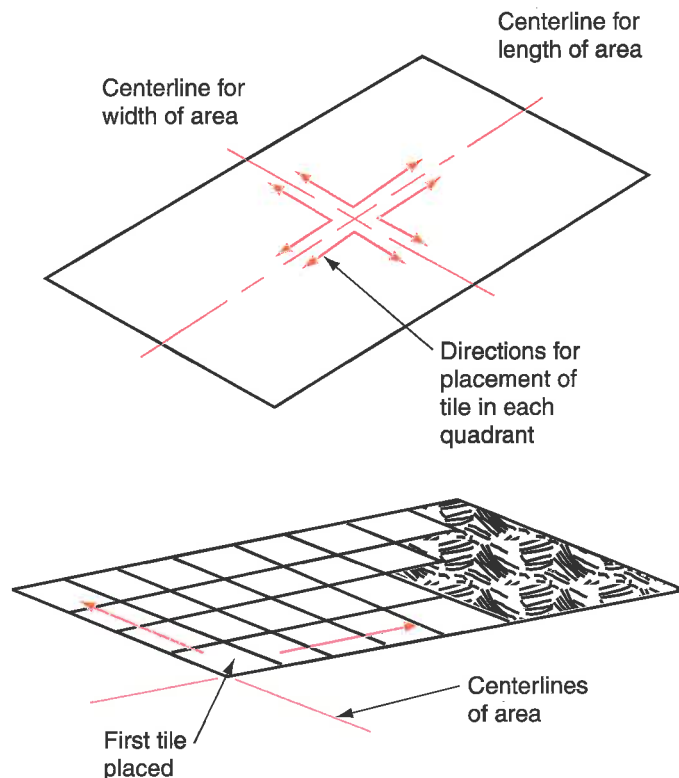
A symmetrical tile layout begins at the center of the area to be tiled. Then lay the tile toward the wall along the centerlines.
